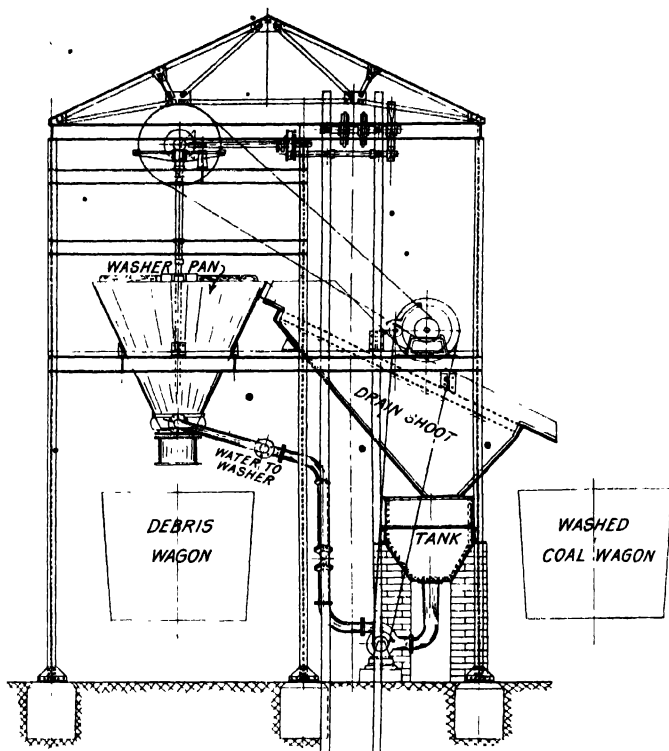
Arrangement of Robinson Washery. Side elevation.
